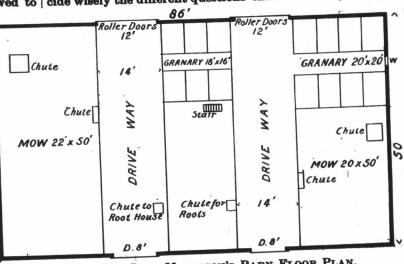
Fig. I.-Mr. John Morrison's Barn Floor Plan.
